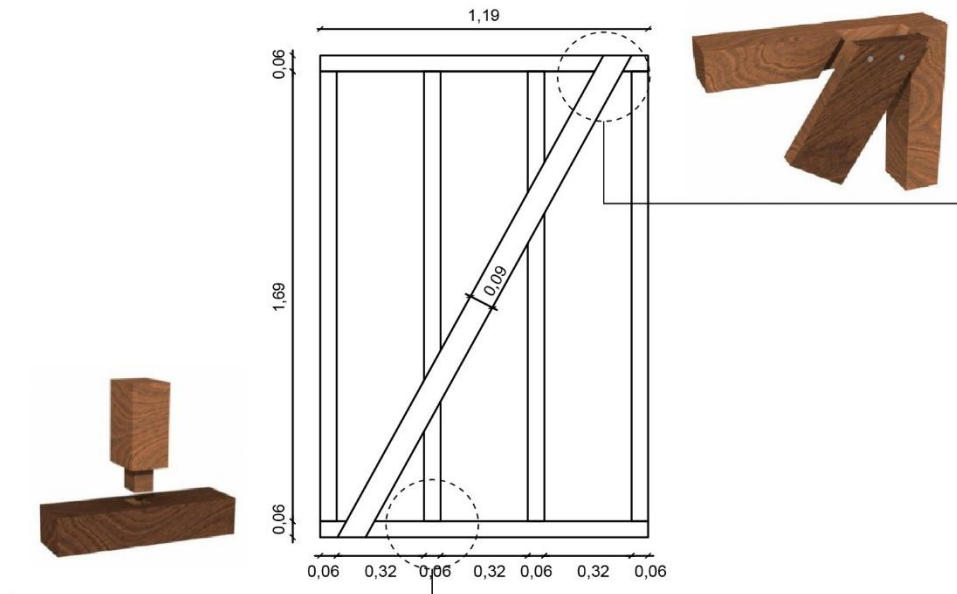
Half-scale quincha frame specimen: geometry and connections (in m).
